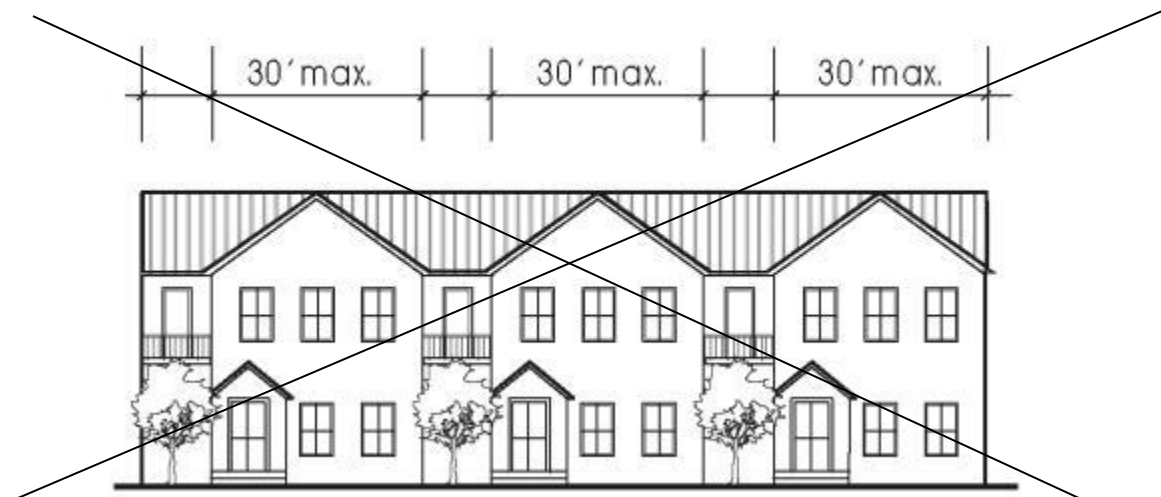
(D): Example of articulation of facades that can help break down the scale of large buildings.
